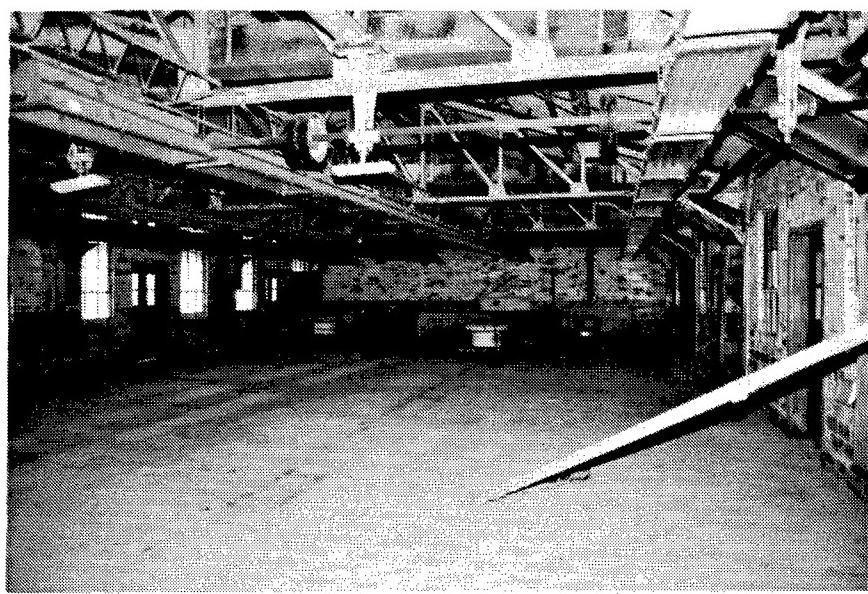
Building 2F-31: Interior view of this Delay Loading Building.
